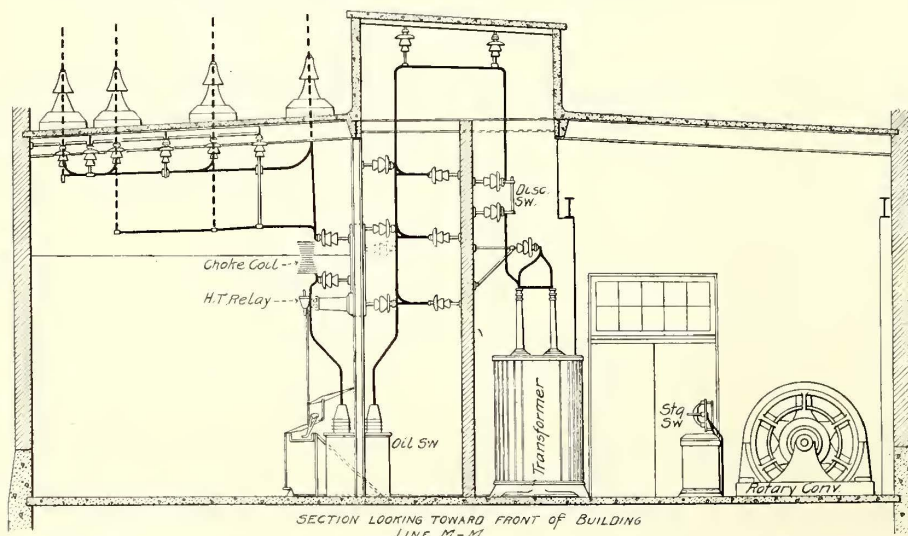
Milwaukee 1200-Volt Line—Sectional View of Typical Substation. (For Plan, See Fig. 9)
